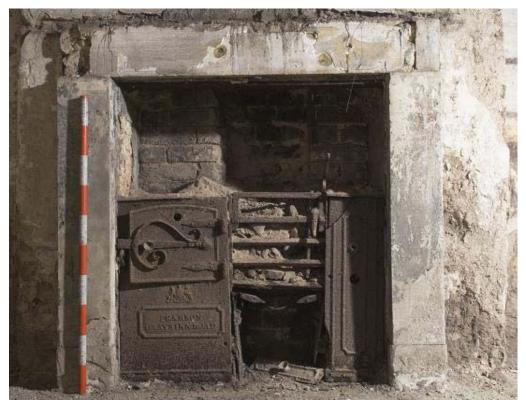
Cast-iron stove/oven in Room CFO1B5 (Figure 26)
